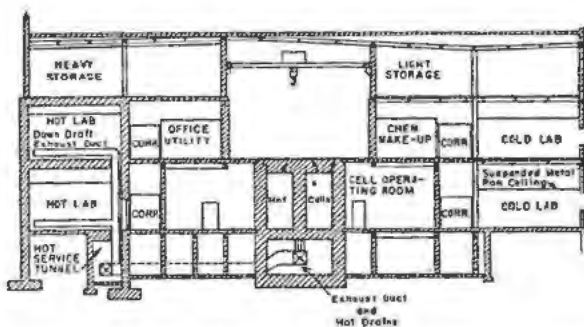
Isotope research building: section in elevation of a radiochemical laboratory building with hot down-draft exhaust in a basement service tunnel
